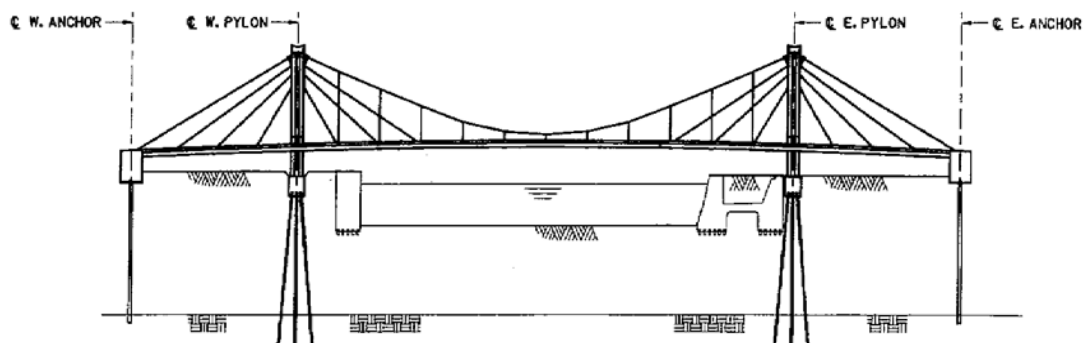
Completed North Ave. Bridge after Load Transfer and Removal of Temporary Structural Systems, *Courtesy of McHugh Construction / Bridge Concepts*³
